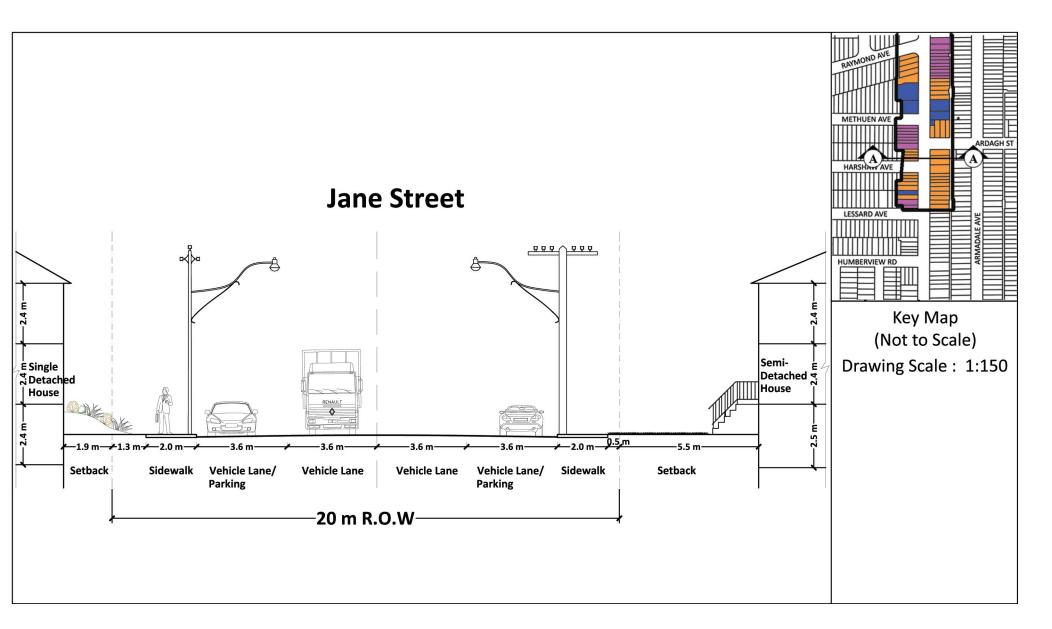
Jane Street Cross-section A (Residential on both sides)
